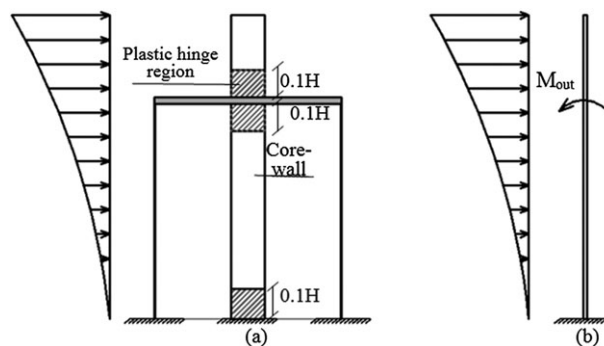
(a) Schematic elevation of three plastic hinge concepts in the RC core-wall and (b) moment exerted from outrigger on the core-wall.
